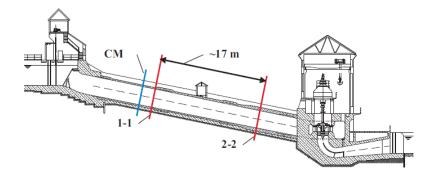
Longitudinal section through Zur HPP with marked hydrometric sections measurement [14].
